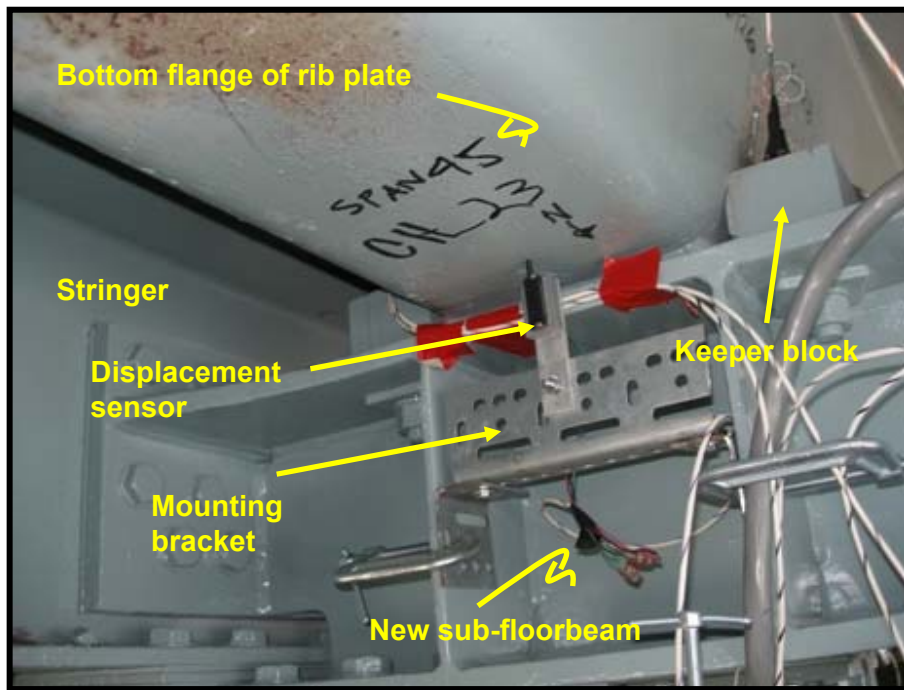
Displacement sensor CH_23 installed in Span 45 to measure the relative displacement between the bottom flange of the rib plate and the new sub-floorbeam
